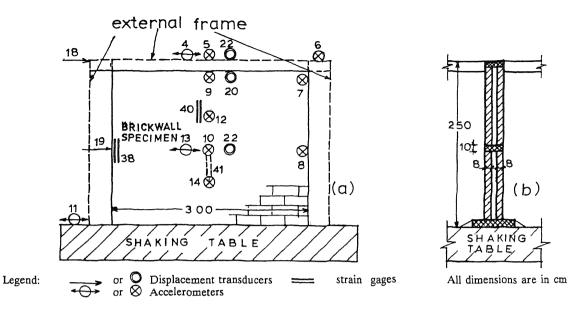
Front view and elevation of the specimen. Presentation of the instrumentation.
